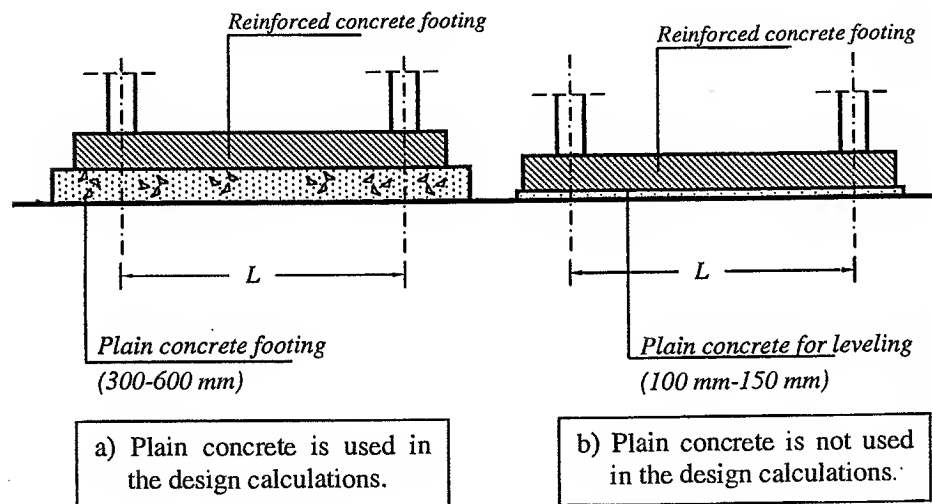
Reinforced concrete combined footings with or without plain concrete footings
